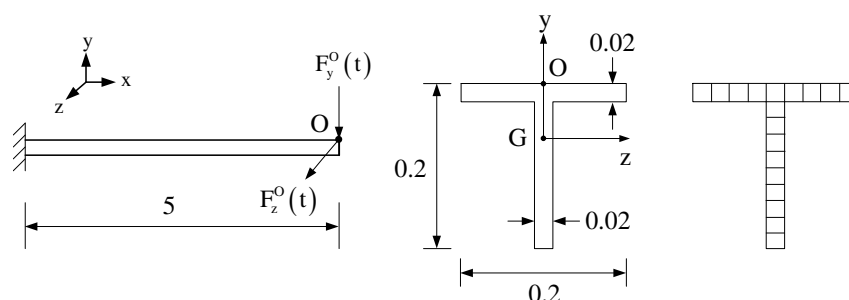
Cantilever beam with T cross-section : geometrical data.
